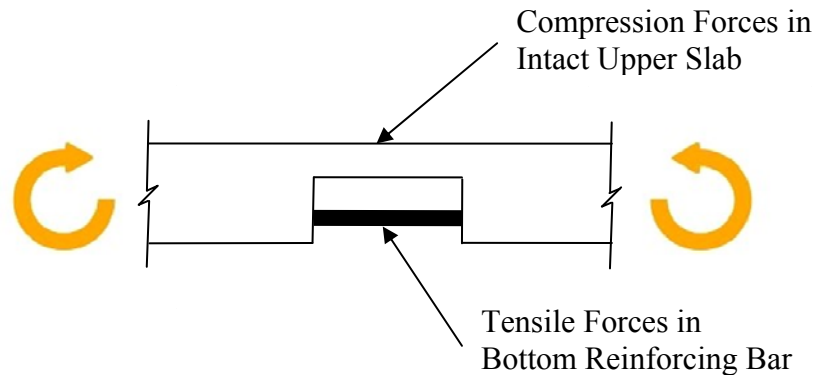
Elevation View of Longitudinal Joint in Positive Flexure
